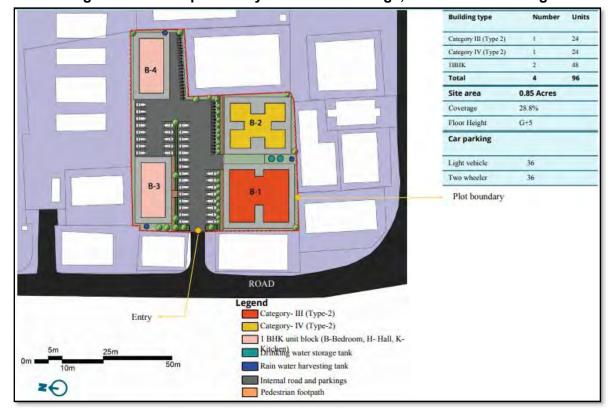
The Proposed Layout of the Buildings, Access and Parking
